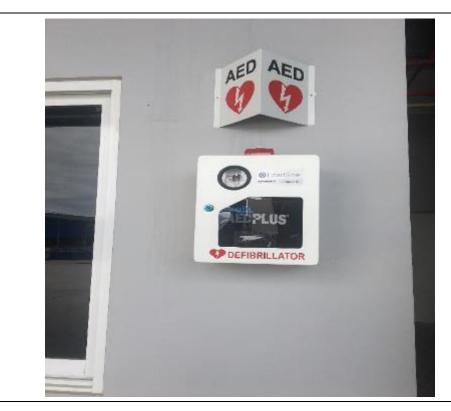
The site has installed four (4) automated external defibrillators (AEDs) onsite.
